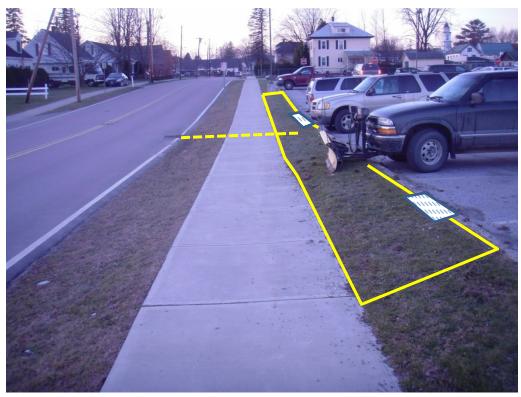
Curb cuts could intercept stormwater runoff from the parking lot as shown. Water could be treated in an infiltration or filter trench within the existing green strip.
